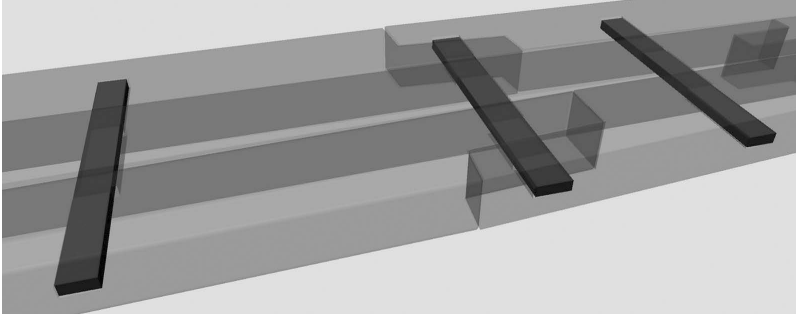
Reconstructed model showing *jangsak*. Drawing by author.
